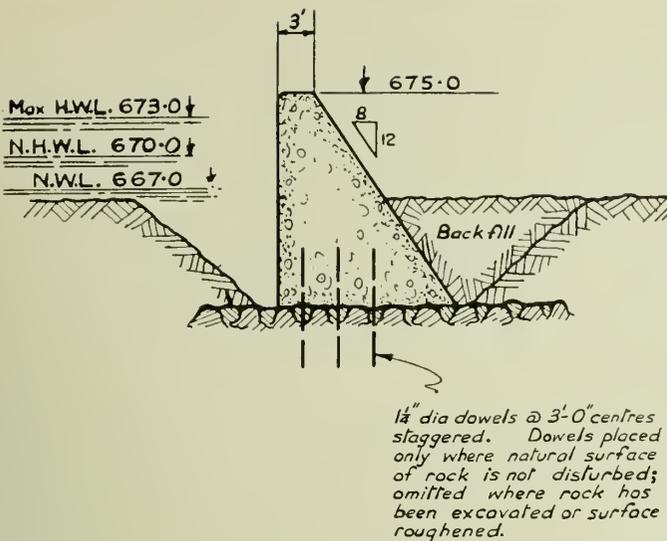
Typical Section of Concrete Bulkheads uniting Headworks with Auxiliary Dam between Spillwall and Main Dam.
